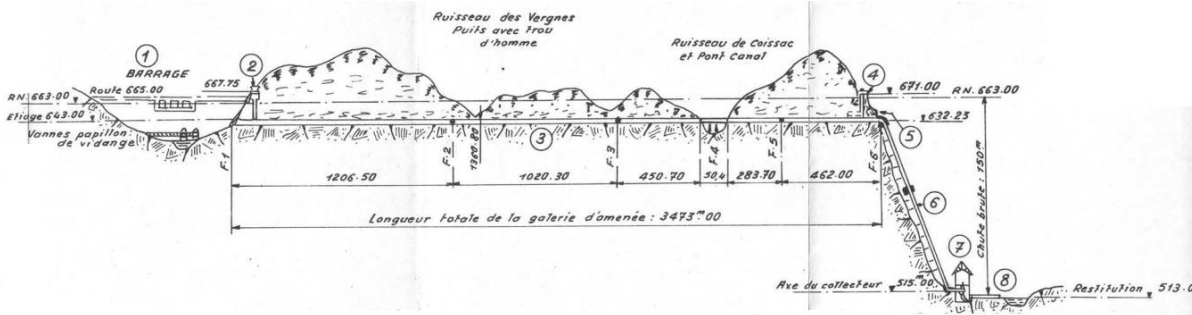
Hydraulic layout of the Monceaux-la-Virole power plant.
